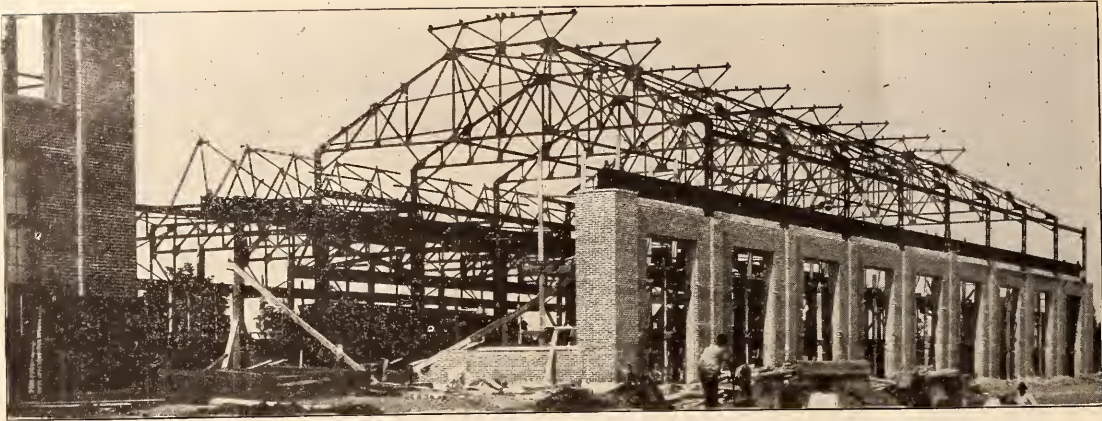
VIEW SHOWING STEEL CONSTRUCTION OF BOILER SHOP—C. & E. I. R. R.
